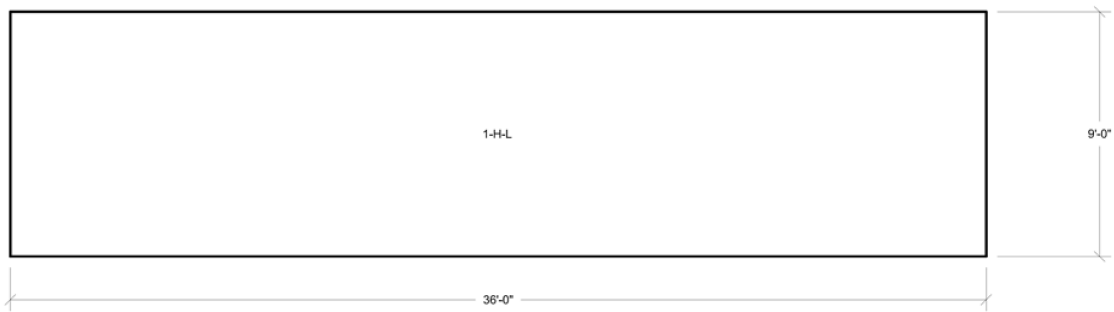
H.7-12 Tunnel Walls Looking From Outside Horizontal Reinforcement Zones Far Side Face
